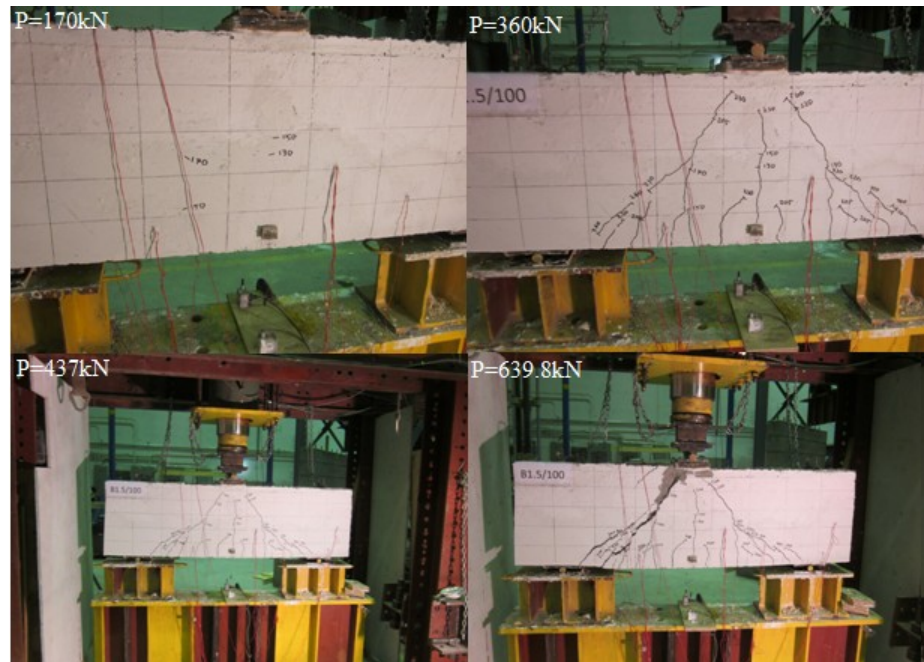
The crack patterns in beam B1.5/100 at four different loading.
